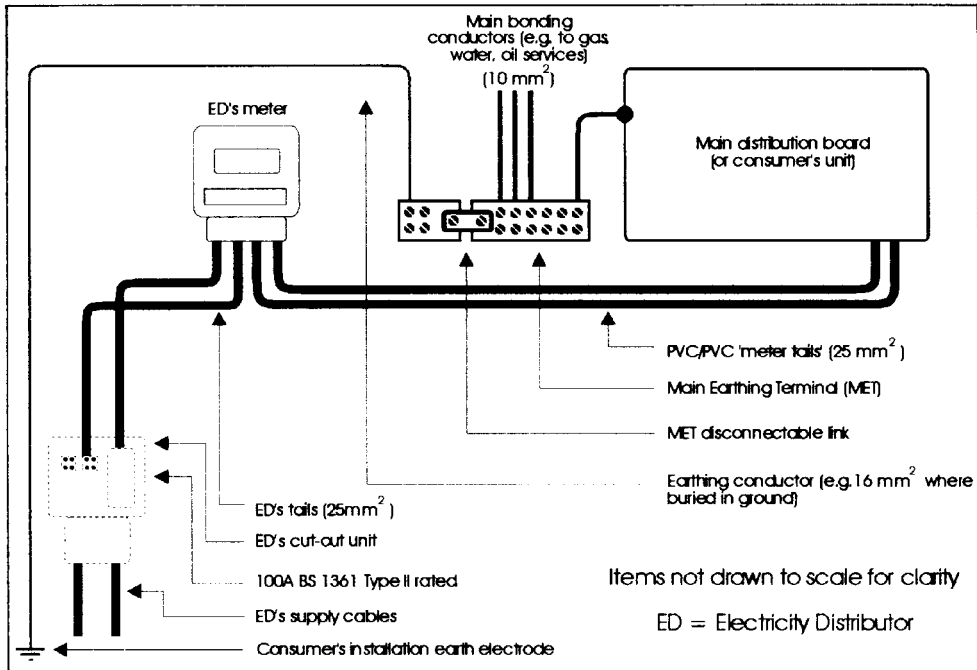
Typical arrangement for connection of a smaller installation on a TT system
